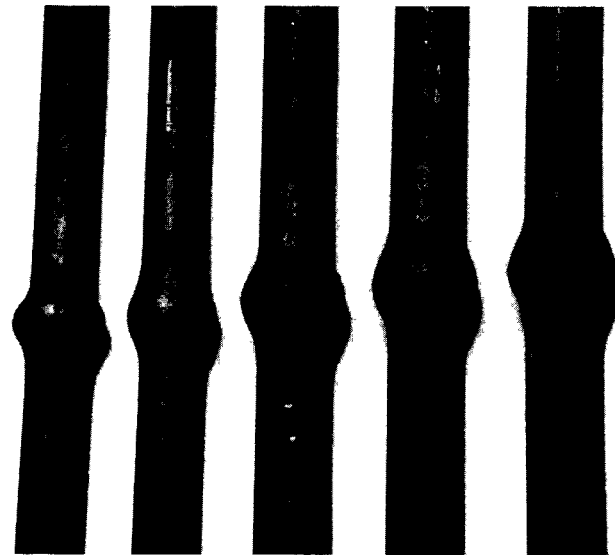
Typical Pressure Gas Welds in 25 mm (1 in.) and 32 mm (1-1/4 in.) Diameter Steel Bars
